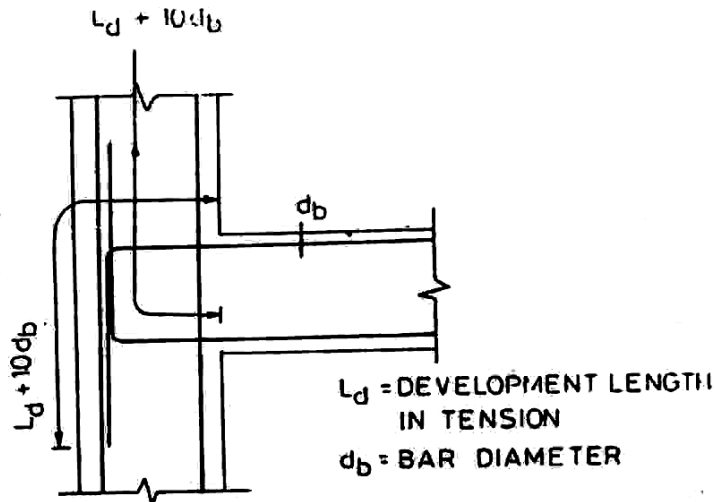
ANCHORAGE OF BEAM BARS IN AN EXTERNAL JOINT
